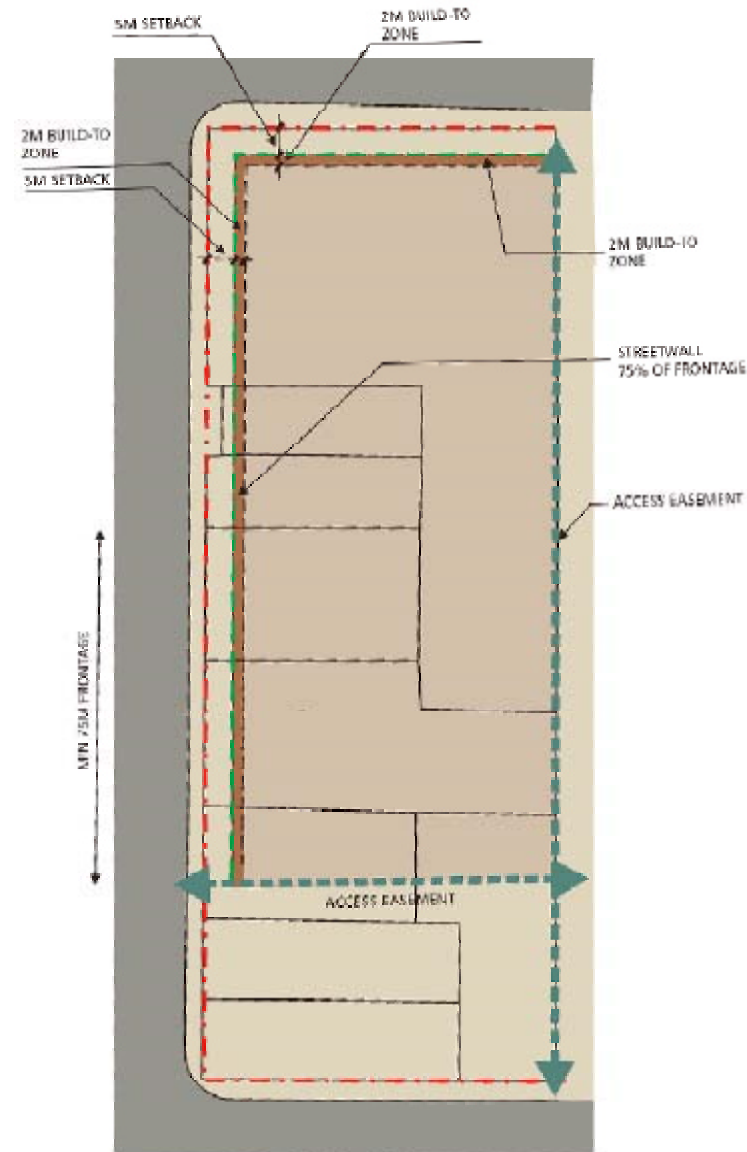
Setbacks, Streetwall, Potential Access Easements Diagram, N.T.S.
